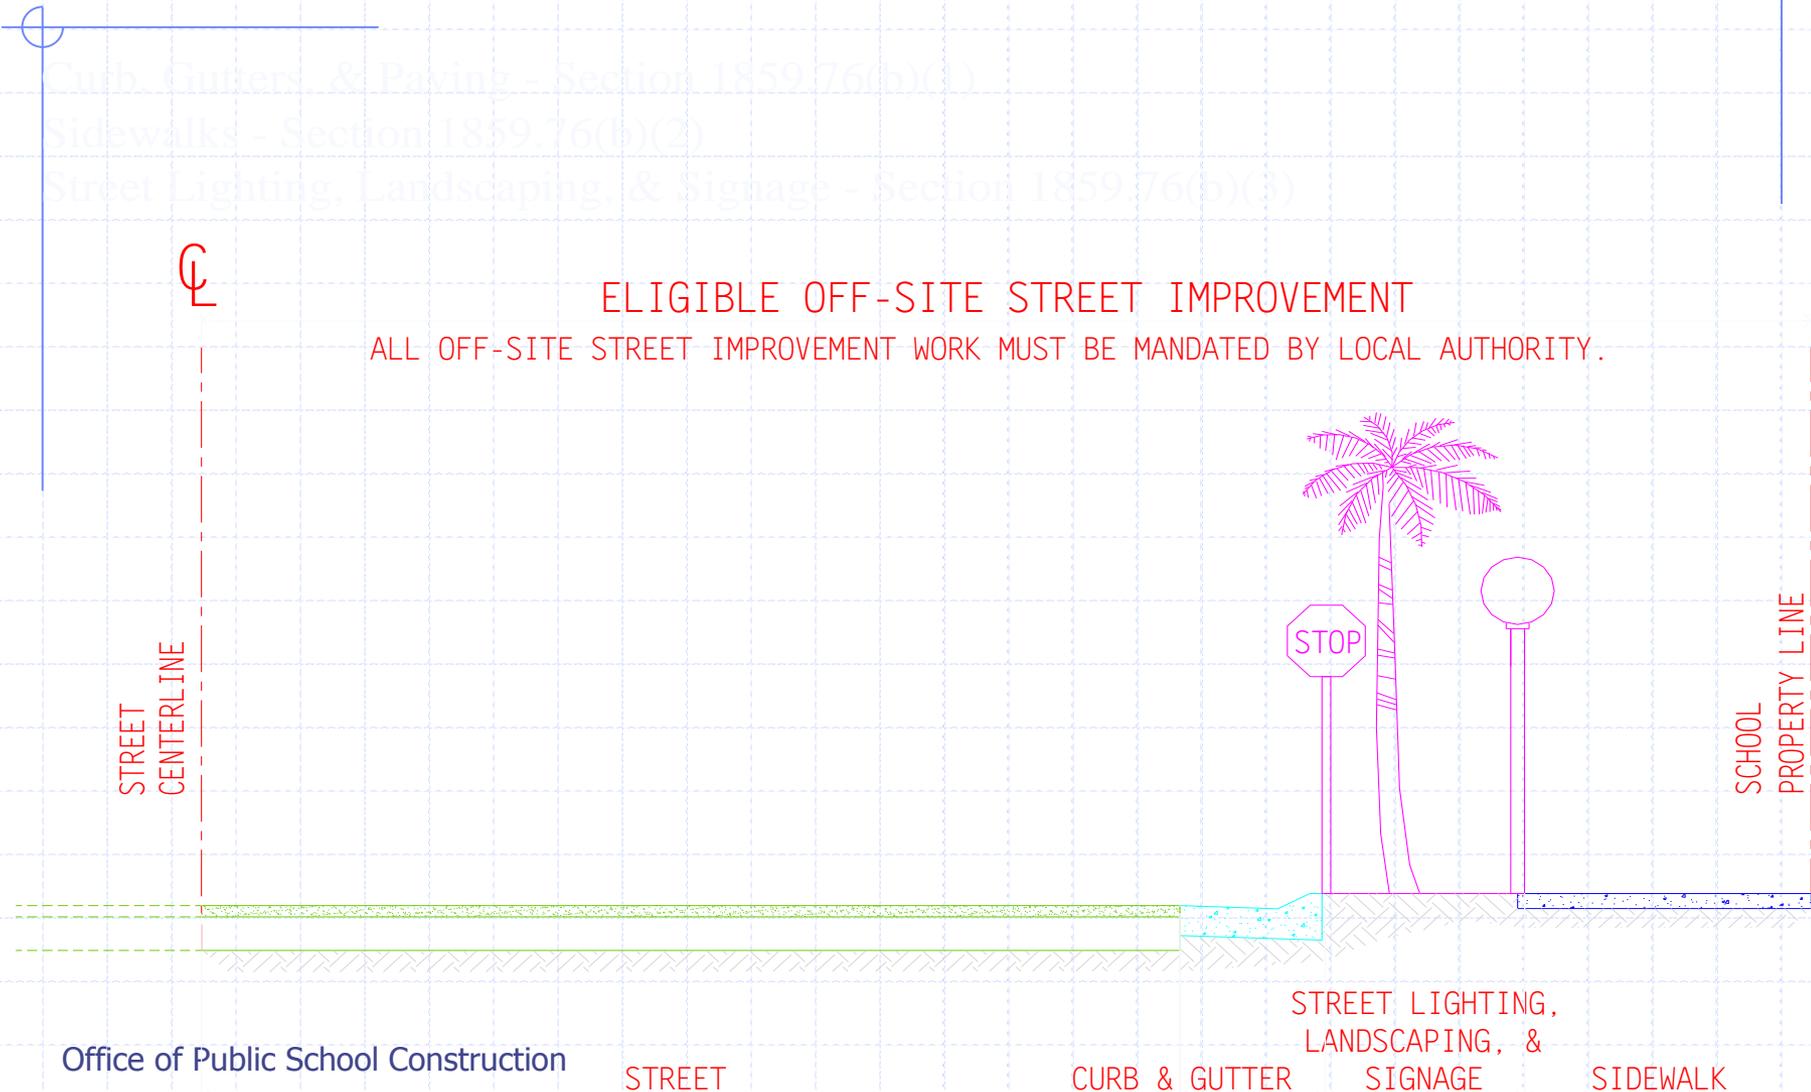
B – OFF-SITE STREET IMPROVEMENT
